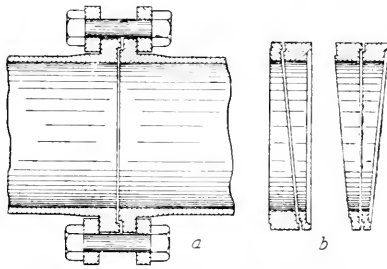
Detail of Joint Connections for Pipe-Line of Water-Power Plant at Vauvry, Switzerland.
